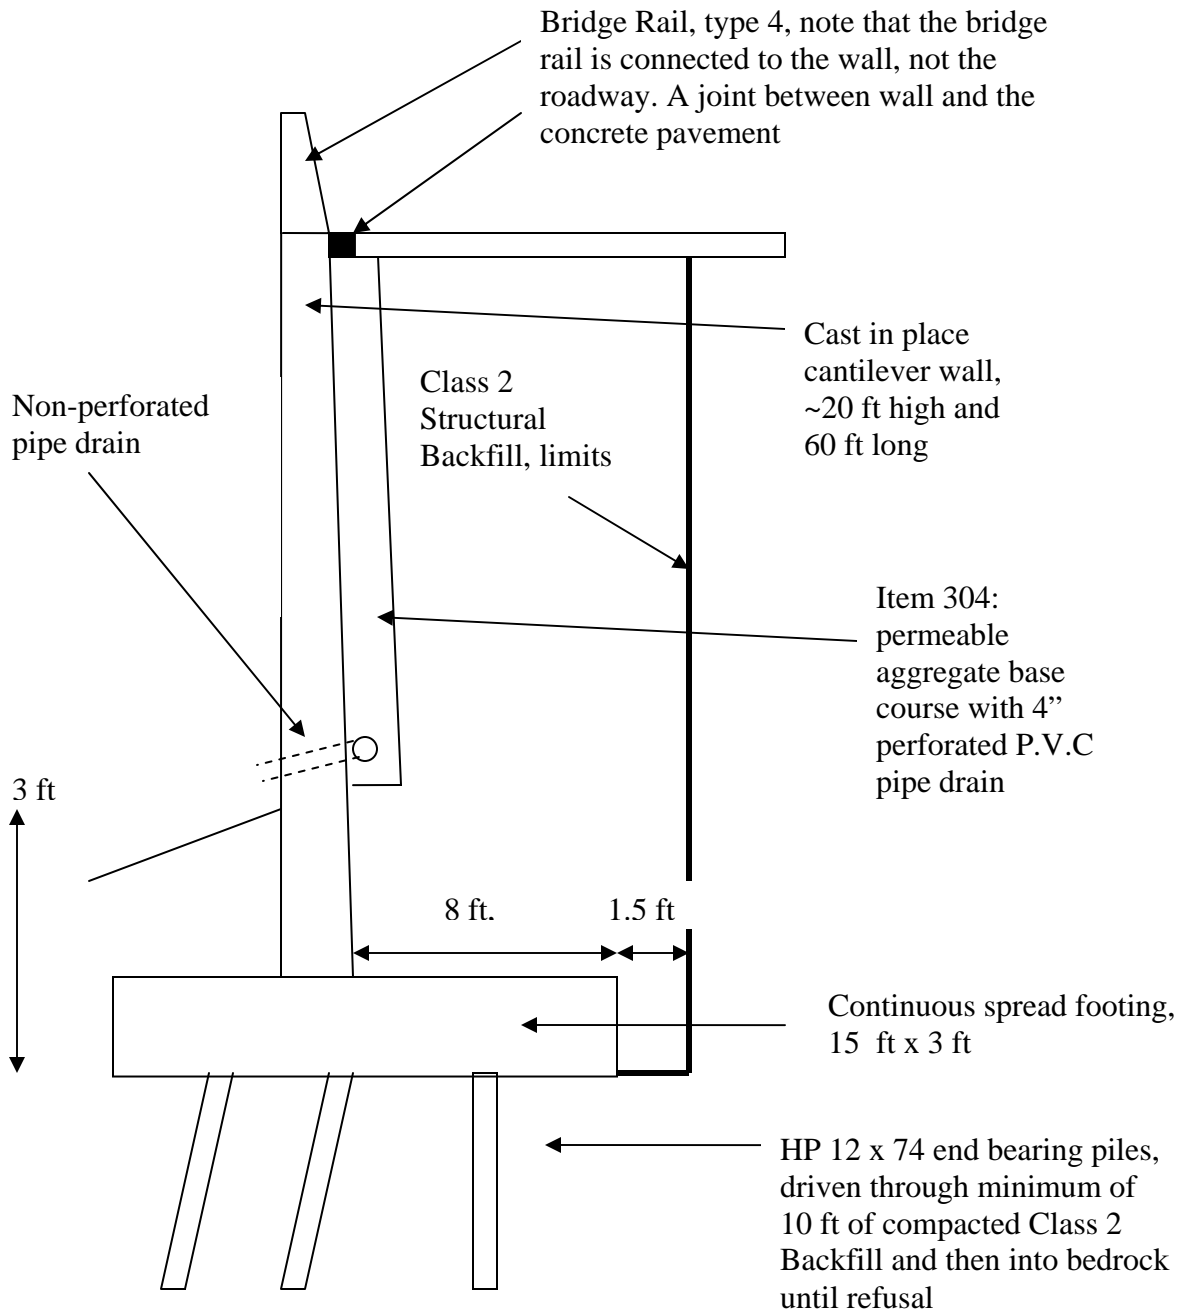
Details of the CIP Retaining Wall Constructed along the Northern-Eastern Side of the I-70/I-225 Ramp.
